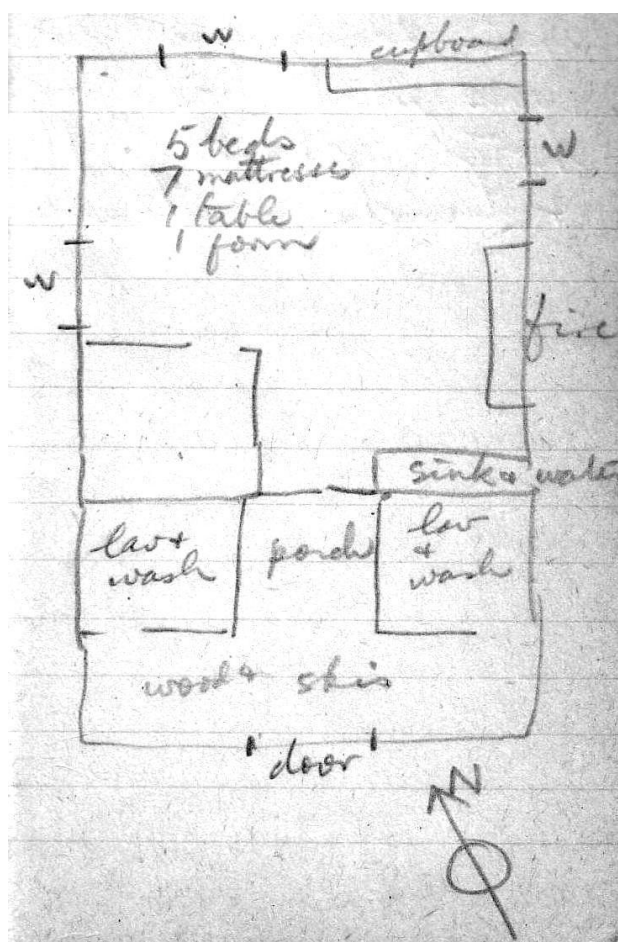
Sketched Floor Plan of Perisher Hut (Frank Leyden, 1945)
